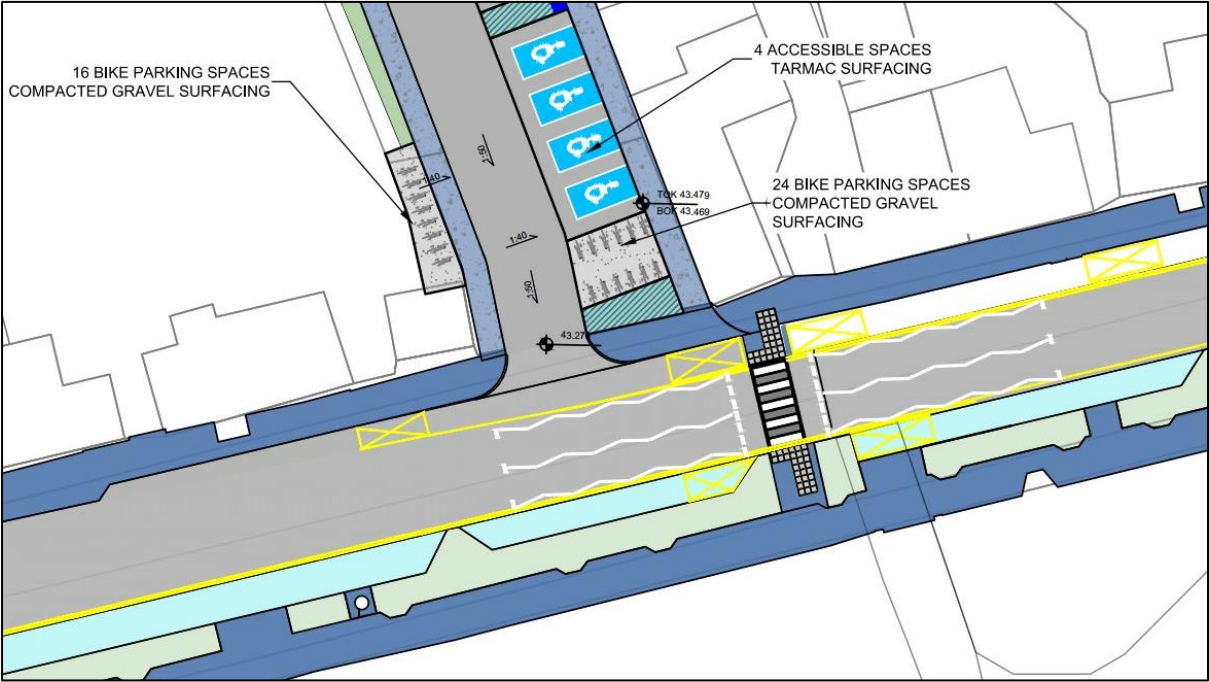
Proposed Village Car Park Entrance Junction Layout Plan
